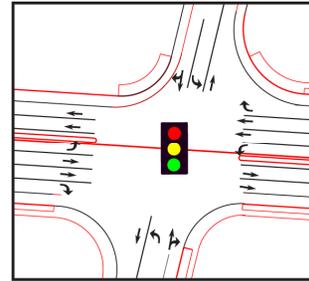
WORKING GROUP ALTERNATIVE BETWEEN MIDWAY AVENUE AND DOWELL ROAD
